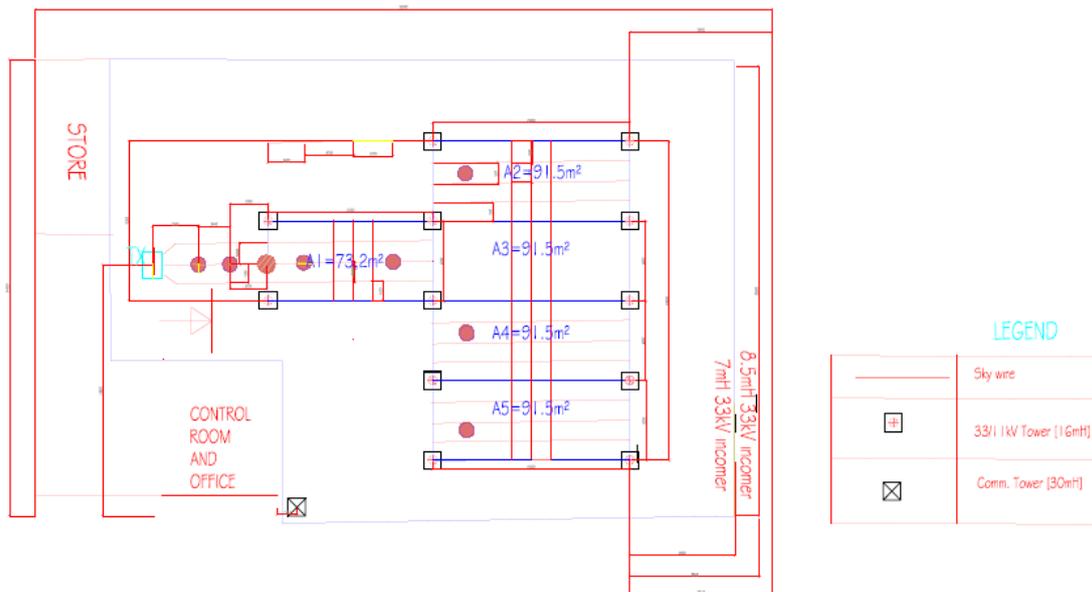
Plan View of Imota, Ikorodu 33/11kV Substation, showing Mesh Method of Screening Substation Elements Typical to Ijede, Ebute and Igbogbo Substation
